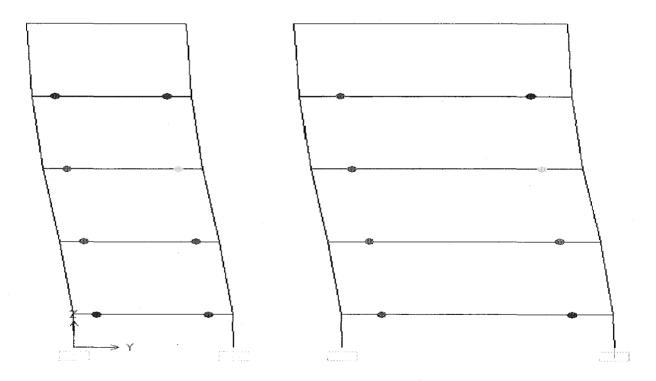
Yield Pattern at Ultimate Point for 4-Storey Building in Transverse Direction Designed as SMRF with Strong Column-Weak Beam
